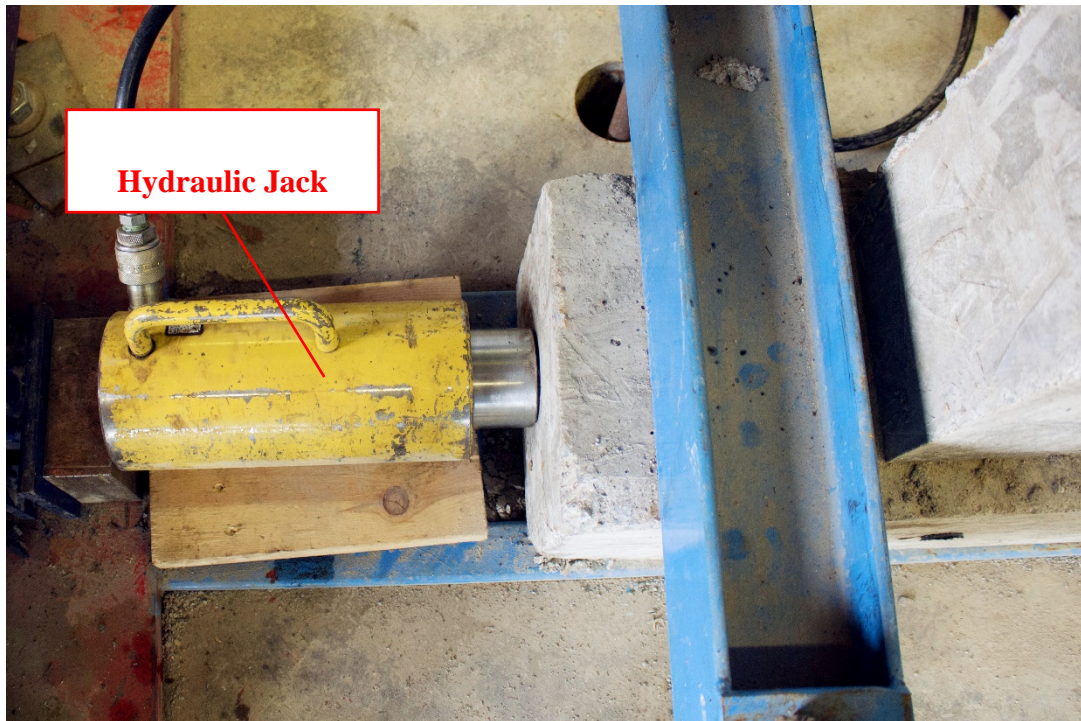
Hydraulic Jack Bracing the Base of Specimen
